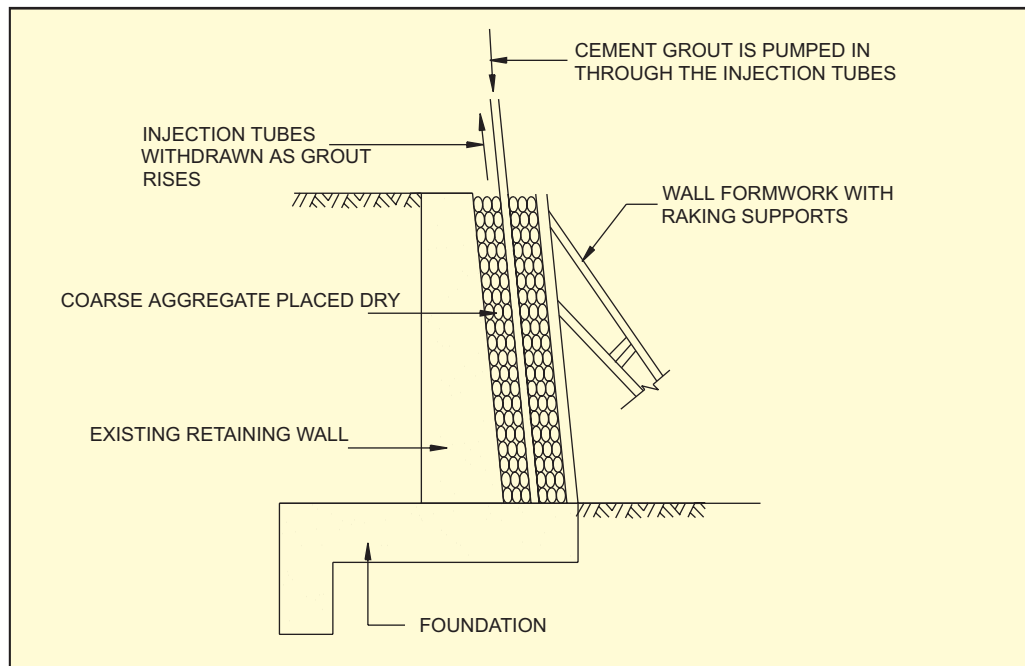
(a) Preplaced Aggregate Concrete Repair to Concrete Wall
